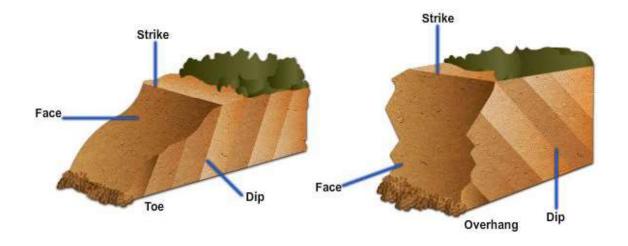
Disadvantage of the opening face parallel to the strike.
